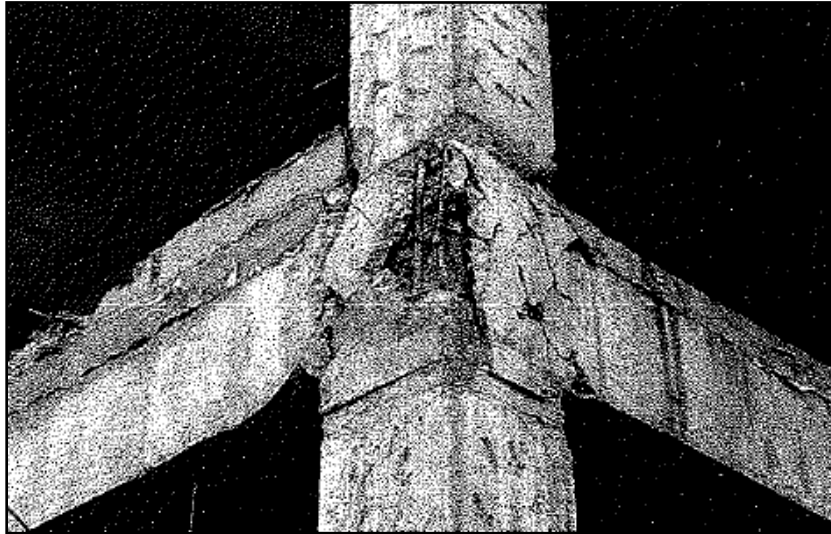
Confinement Failure of Column (Paulay and Priestley 1992, 5)
